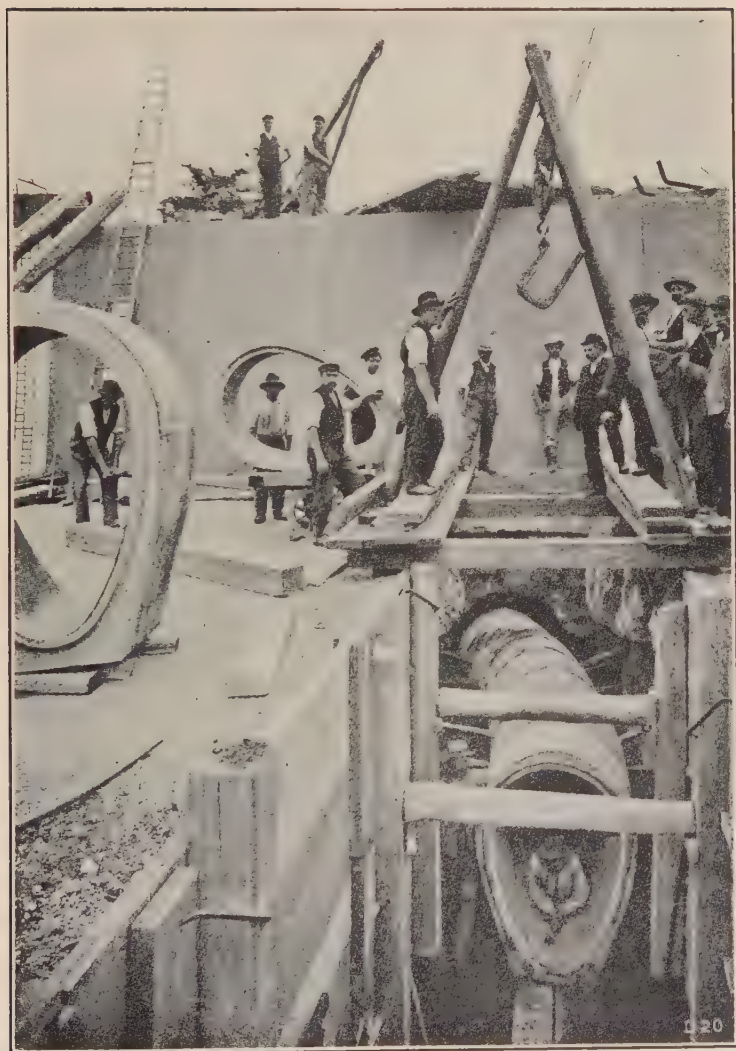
CEMENT PIPE BEING LAID IN HAMBURGER STREET, DRESDEN, GERMANY.
